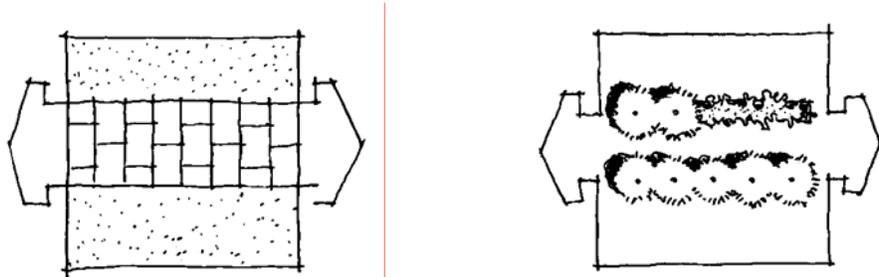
Parking Lots – Paving and Permeable Surfaces & Parking Lots – Pedestrian Pathways
